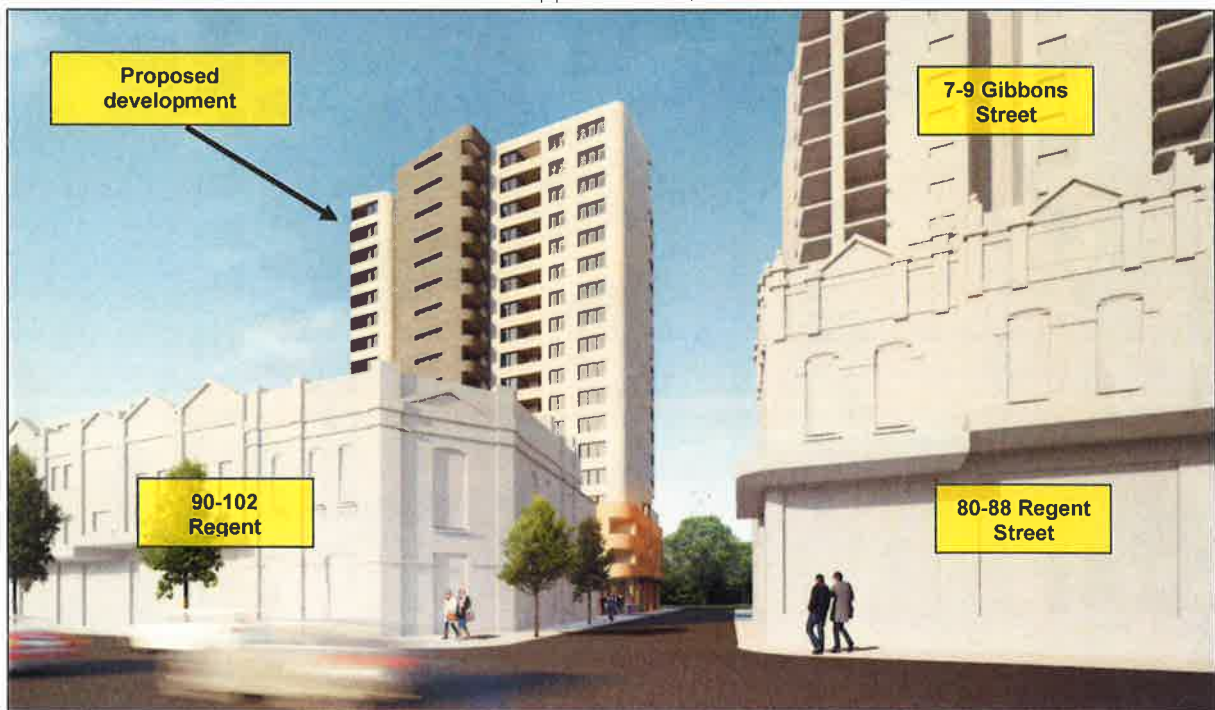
| Perspective of proposed development viewed from Regent Street looking west along Marian Street (Base source: Applicant's RTS)
